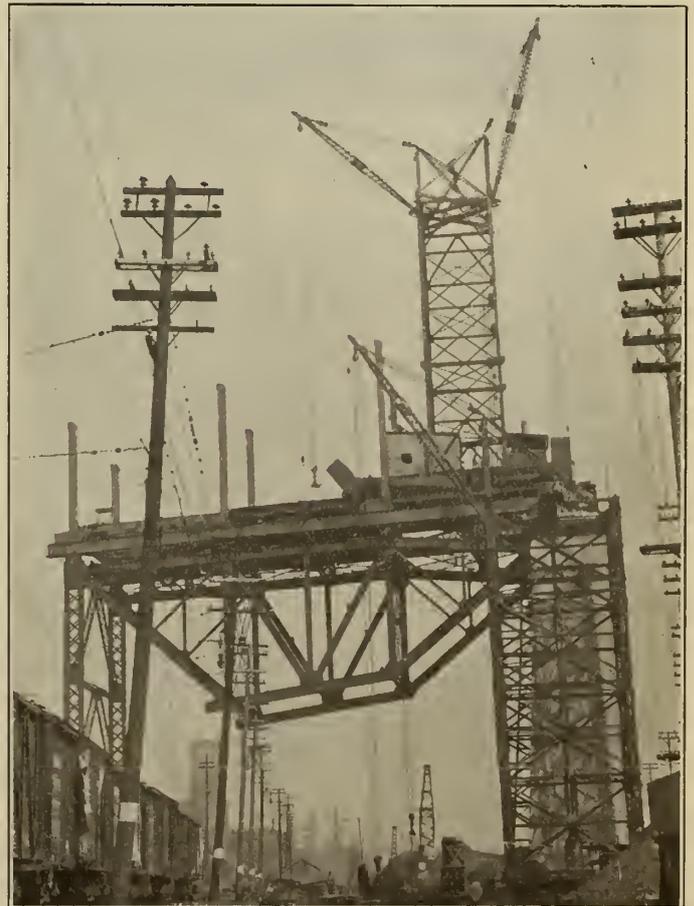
Main Span, North Side—Erecting First Sections of Main Post.
